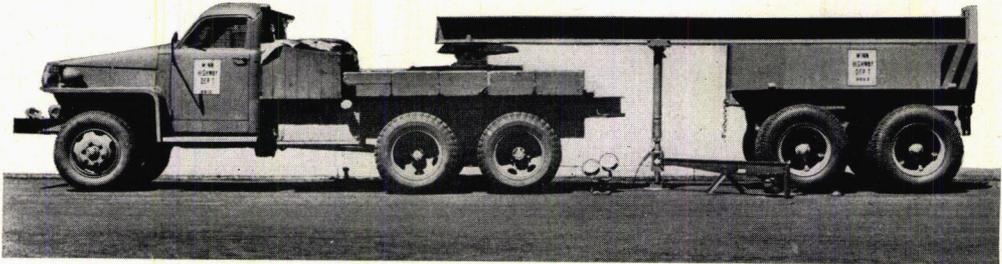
Minnesota's truck-trailer equipment for making plate-bearing tests.
